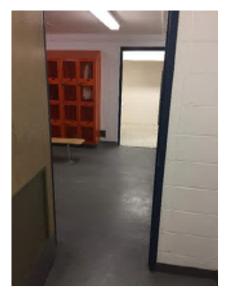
Epoxy flooring install throughout lockers rooms in 2001 addition. Floors are very slippery, surface needs to be refinished with more grit for traction. (Priority 0)
